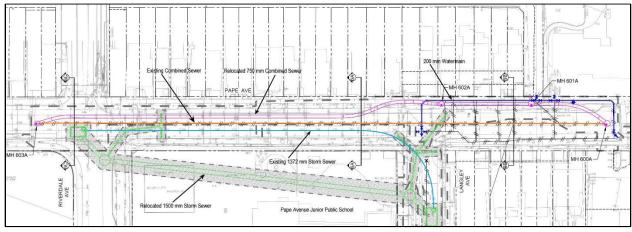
Pape and Riverdale Advanced Works – Location of New Combined Sewer, Watermain and Storm Sewer
